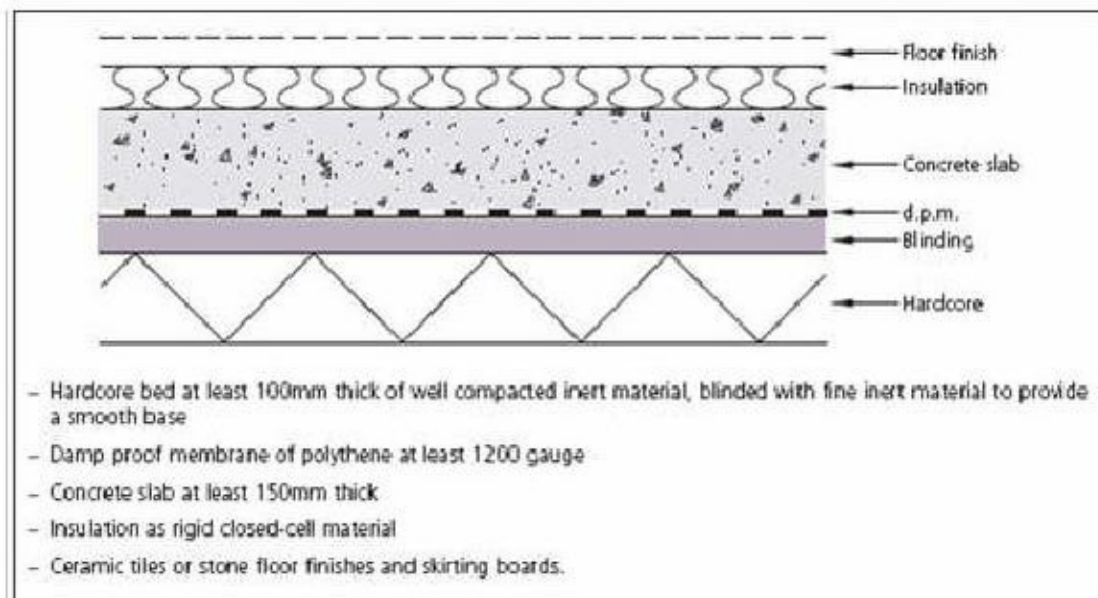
Ground-supported floor (Source: DCLG, 2007)
